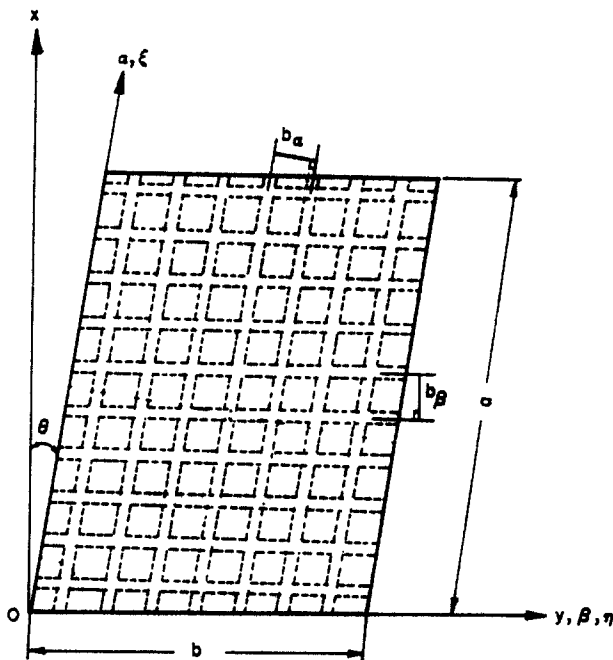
Sketch showing the systems of co-ordinate axes and the plan of skew plate with stiffeners.
